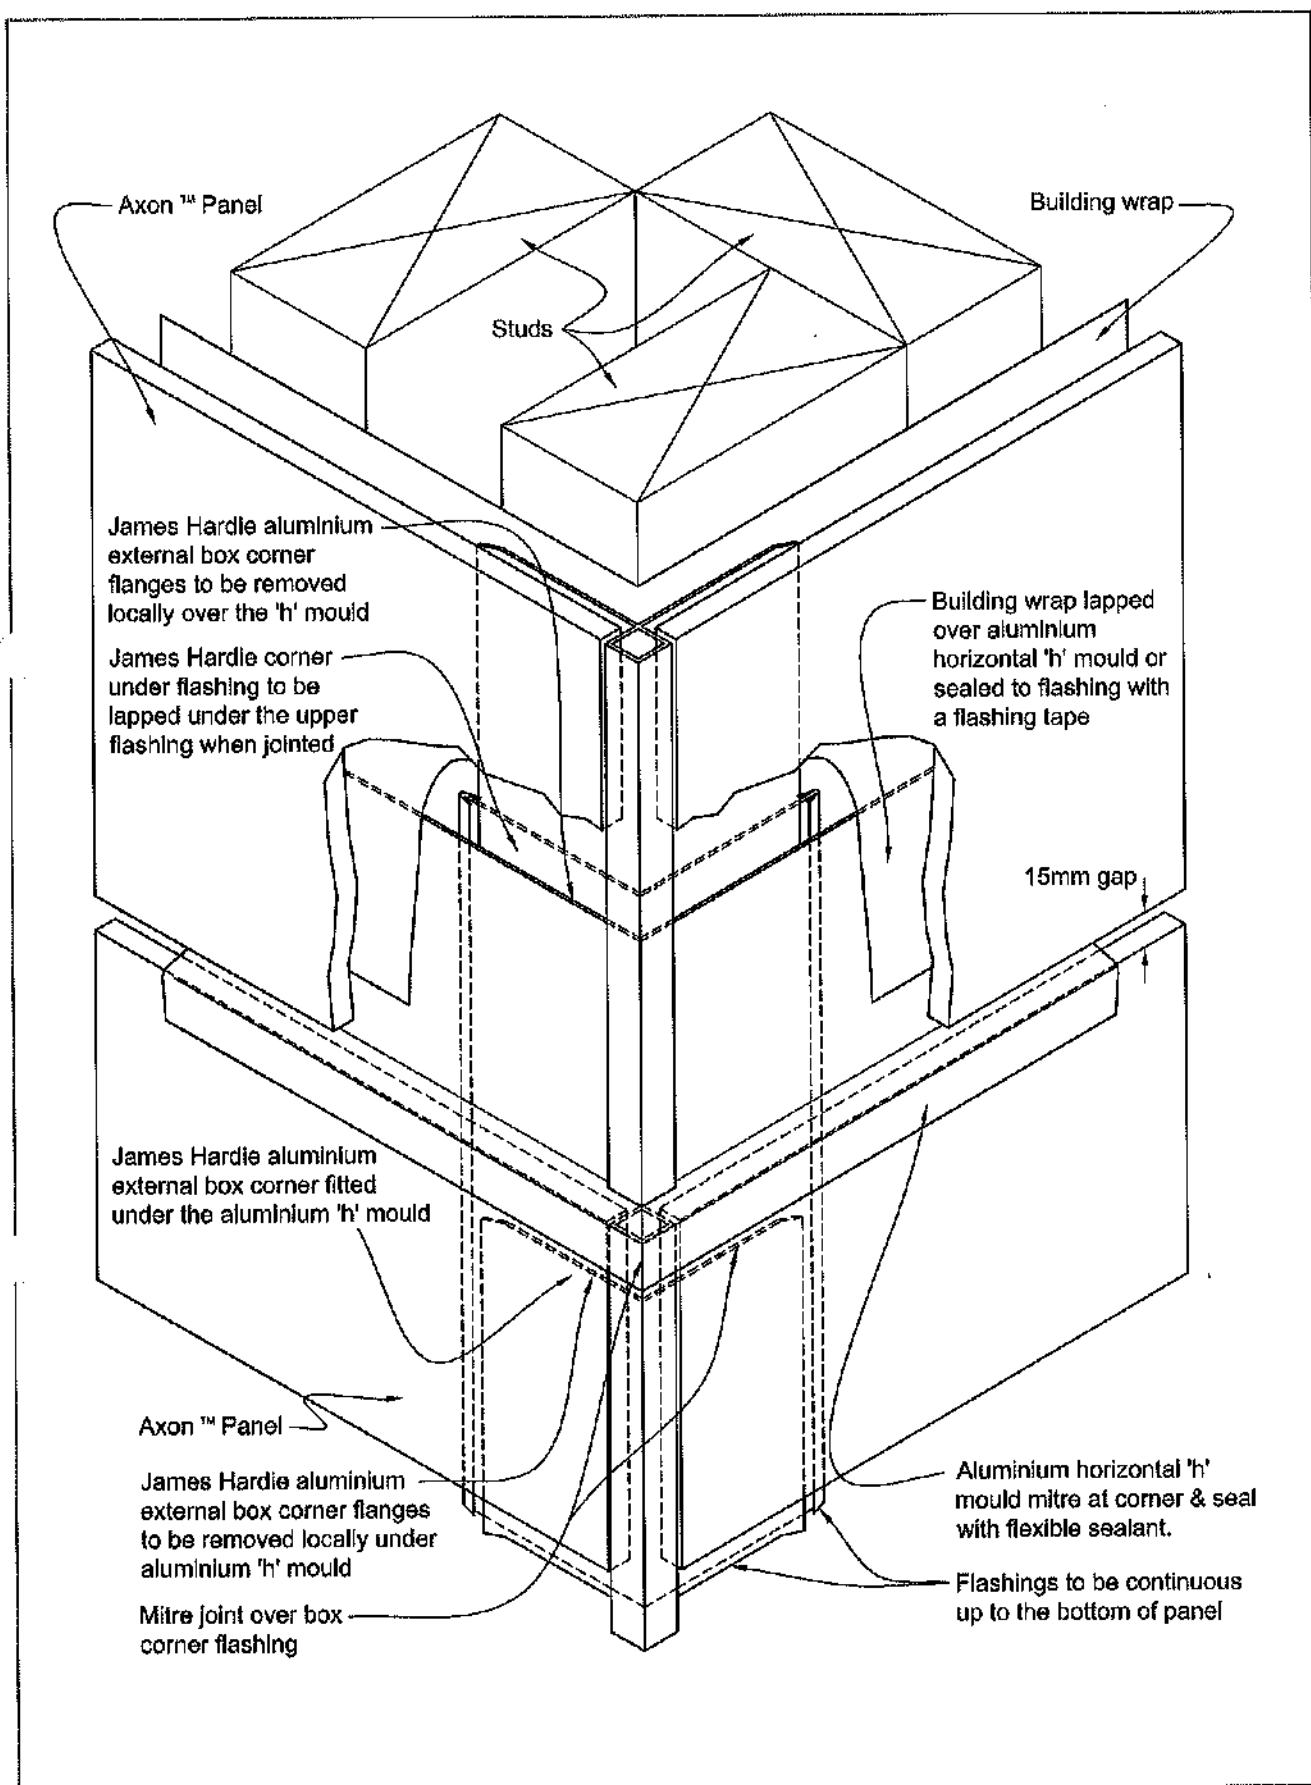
CORNER AT 'H' MOULD JOINT DETAIL
